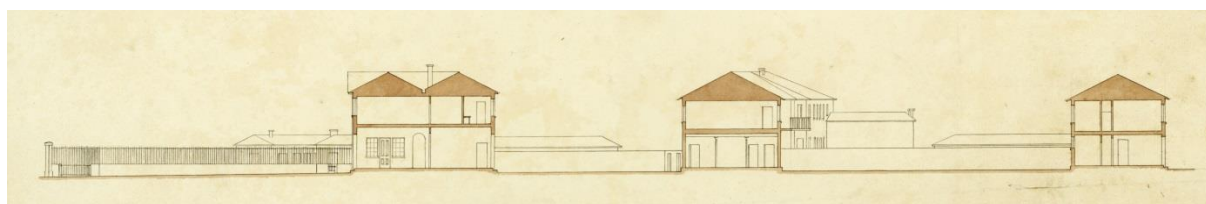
1837 ground plan, cross-section (CA: G/C/AP16.3)
